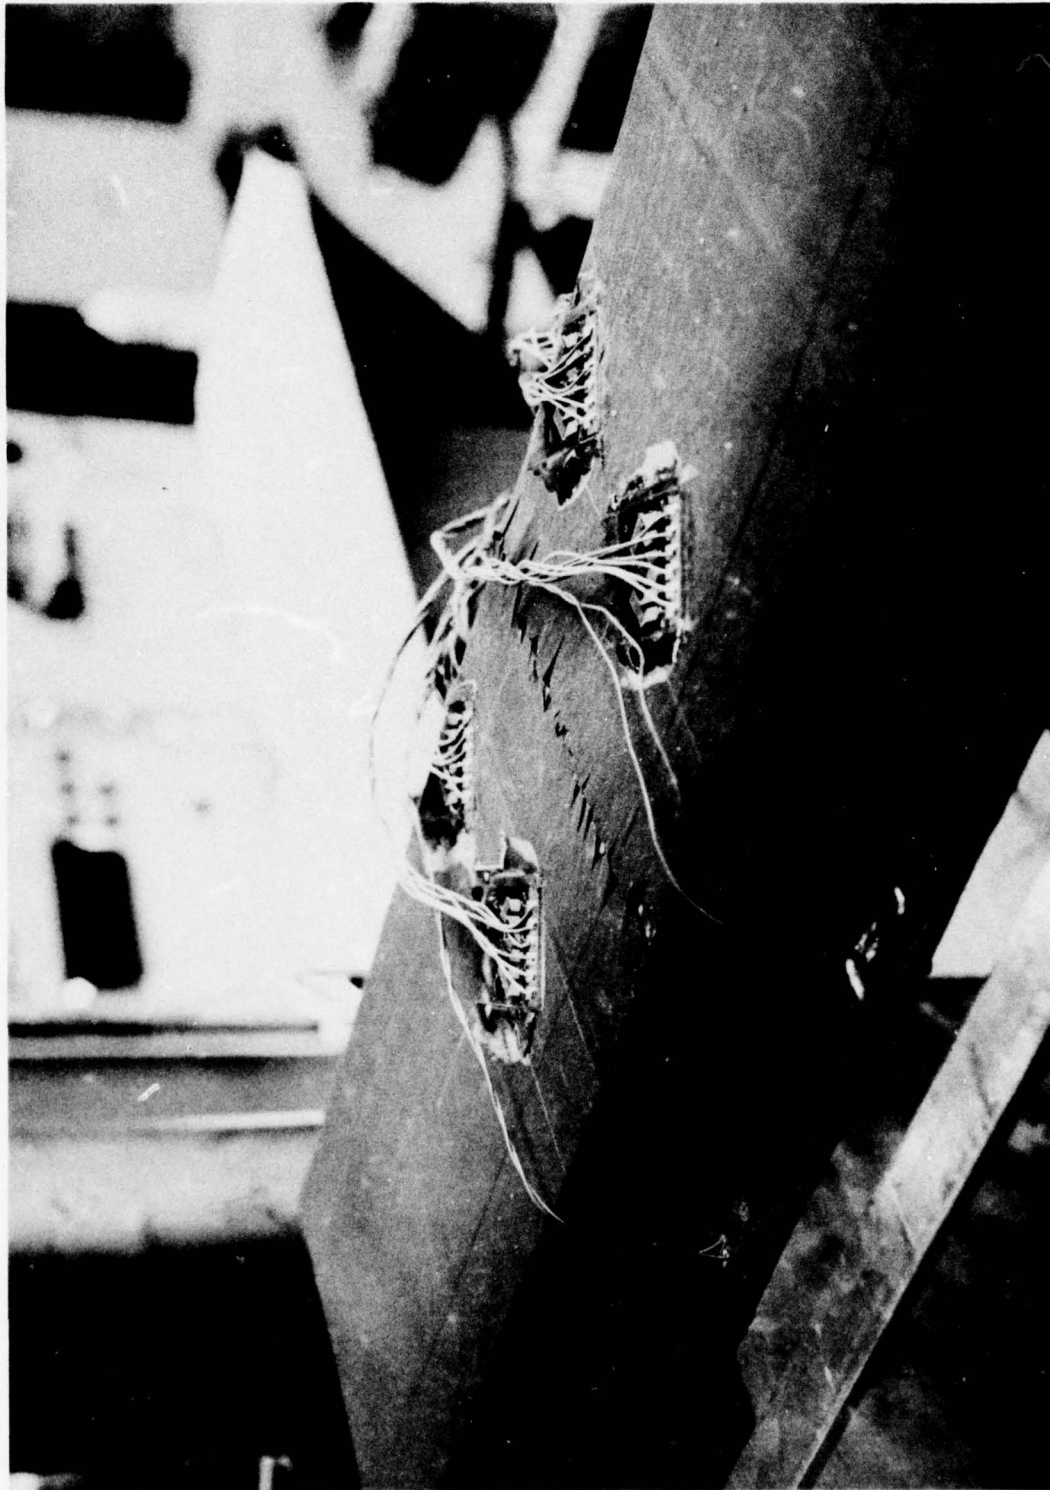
FAILED TEST SPECIMEN WITH EDGE CLOSEOUTS (TR-147)
